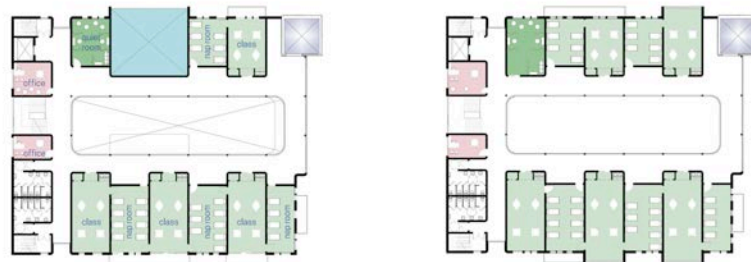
Fourth & Fifth Floor Plans – Classroom Levels
